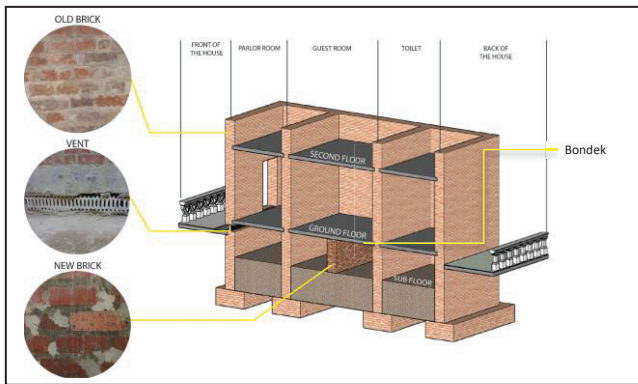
Cross-sectional view showing the actual construction of the historic two-storey building.
